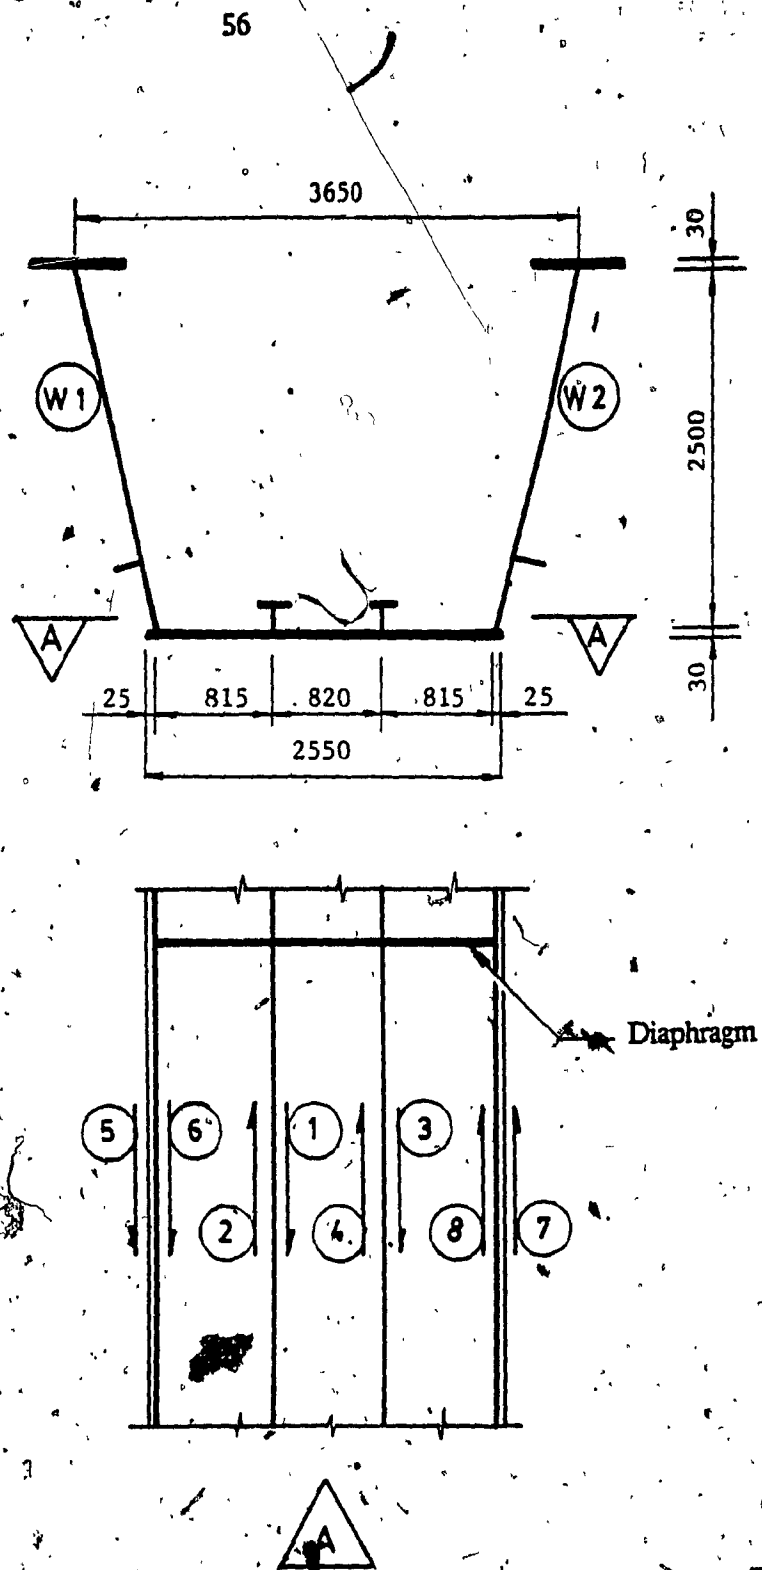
Burlington Skyway Bridge. Welding Sequence of Bottom Flanges
